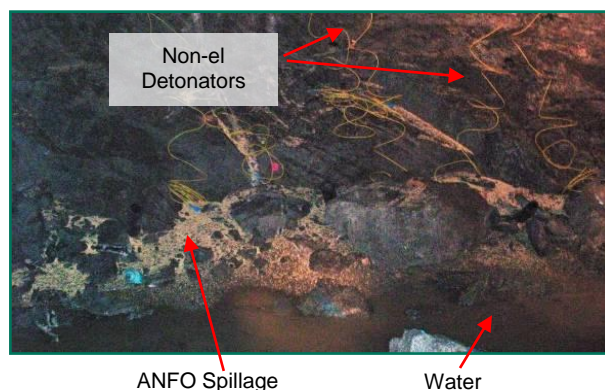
Detail of ANFO spillage from pneumatic blowback while underground loading.
